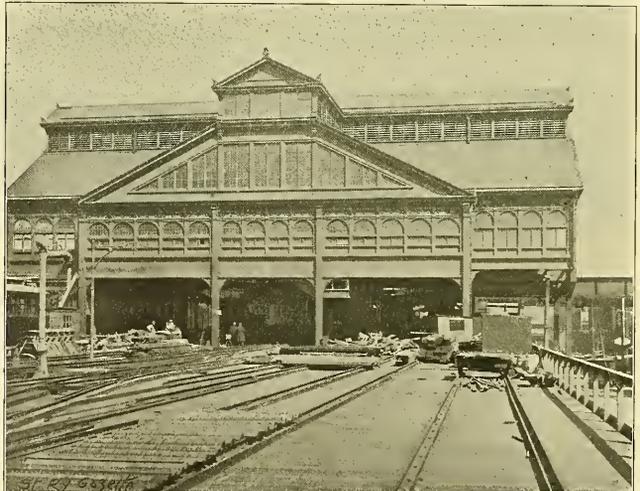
SOUTH FACE OF TERMINAL BUILDING.
